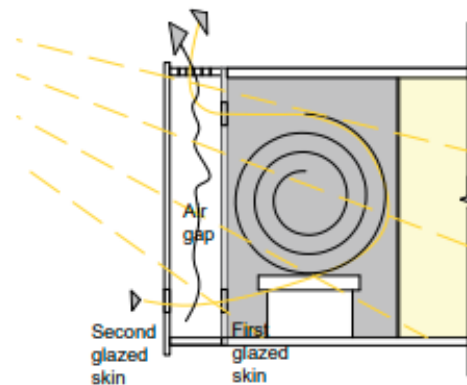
Section c-c shows the double-glazed façade with ventilated air gap.
